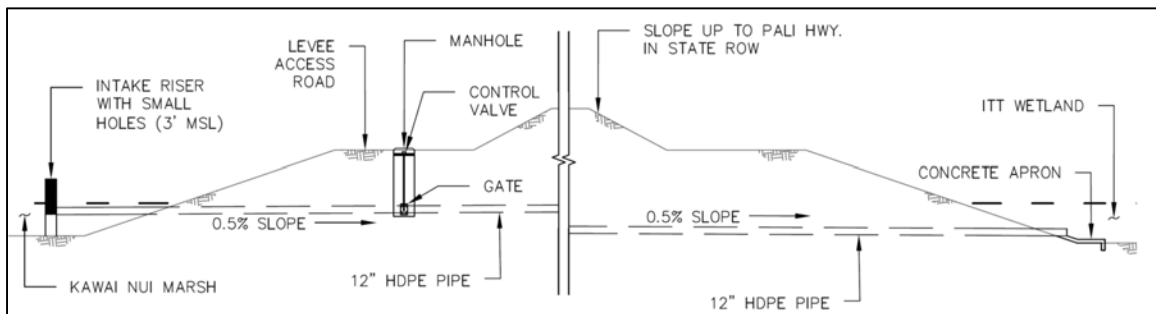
Alternative A3, alignment section of directional drilling around end of levee.
